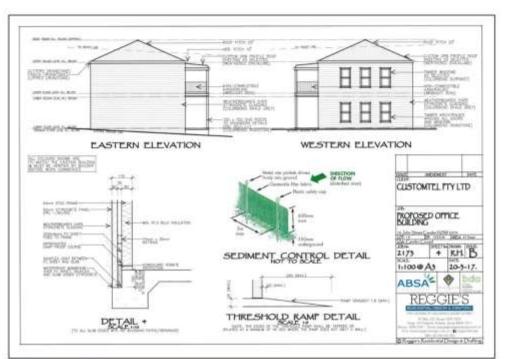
Sheet No. 4, Eastern Elevation, Western Elevation, Detail 4, Sediment Control Detail, and Threshold Ramp Detail.
